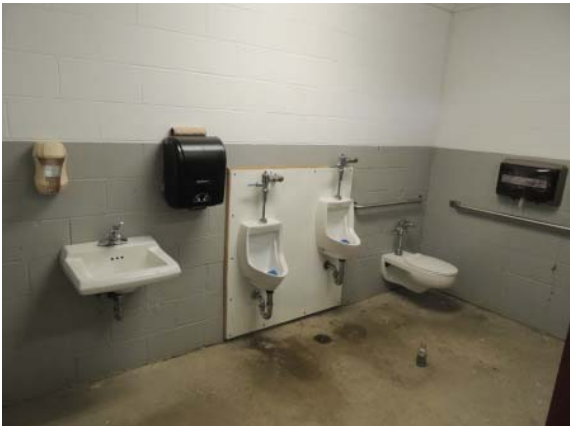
Typical Restroom Located in Out Building Located Near Tennis Courts
